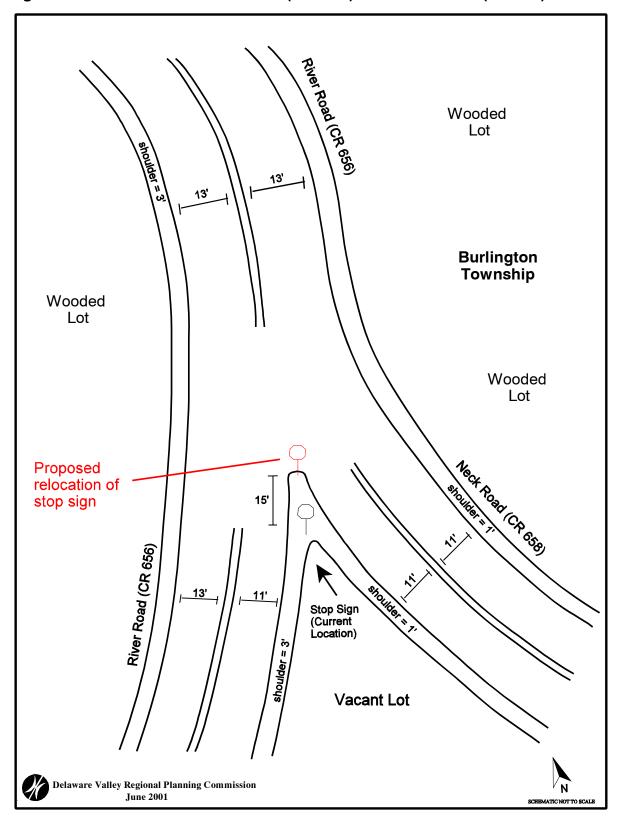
Intersection of Neck Road (CR 658) and River Road (CR 656)
